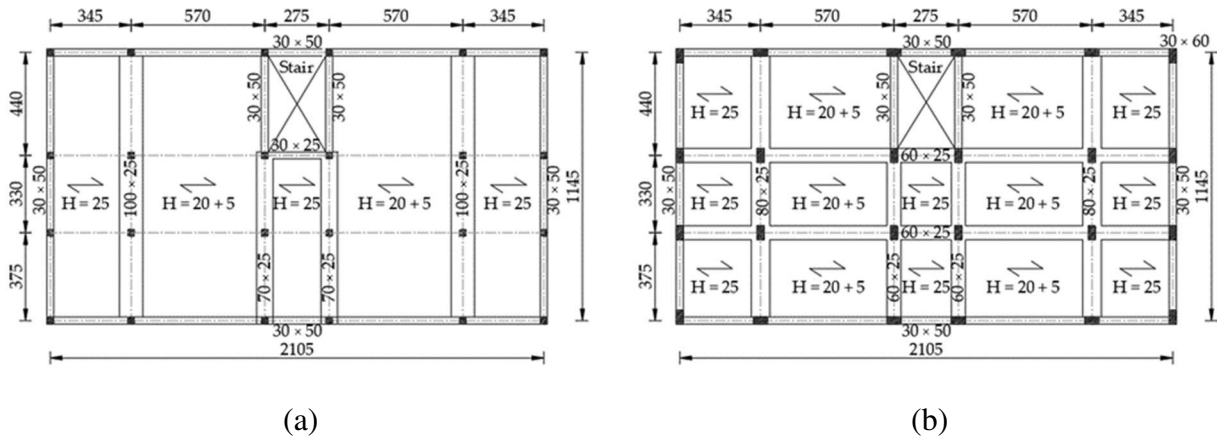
Typical floor plan of the (a) NA_{GLD} and (b) AQ_{SLD} archetype buildings.
